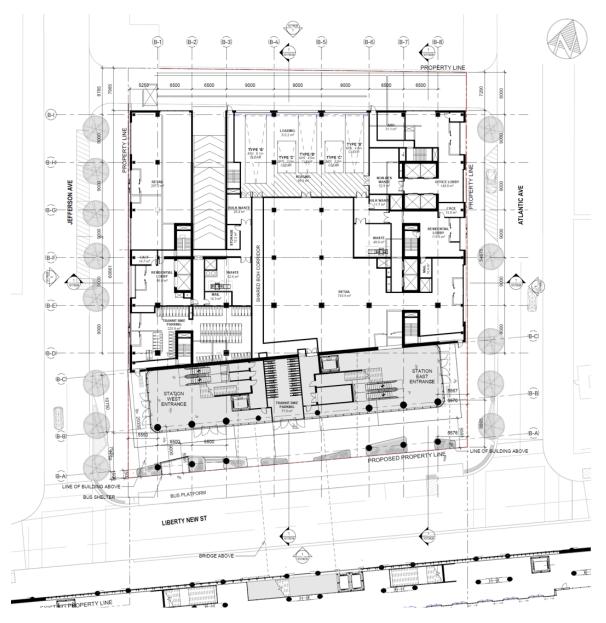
Site B (2-20 Atlantic Avenue, 1 Jefferson Avenue) Site Plan
